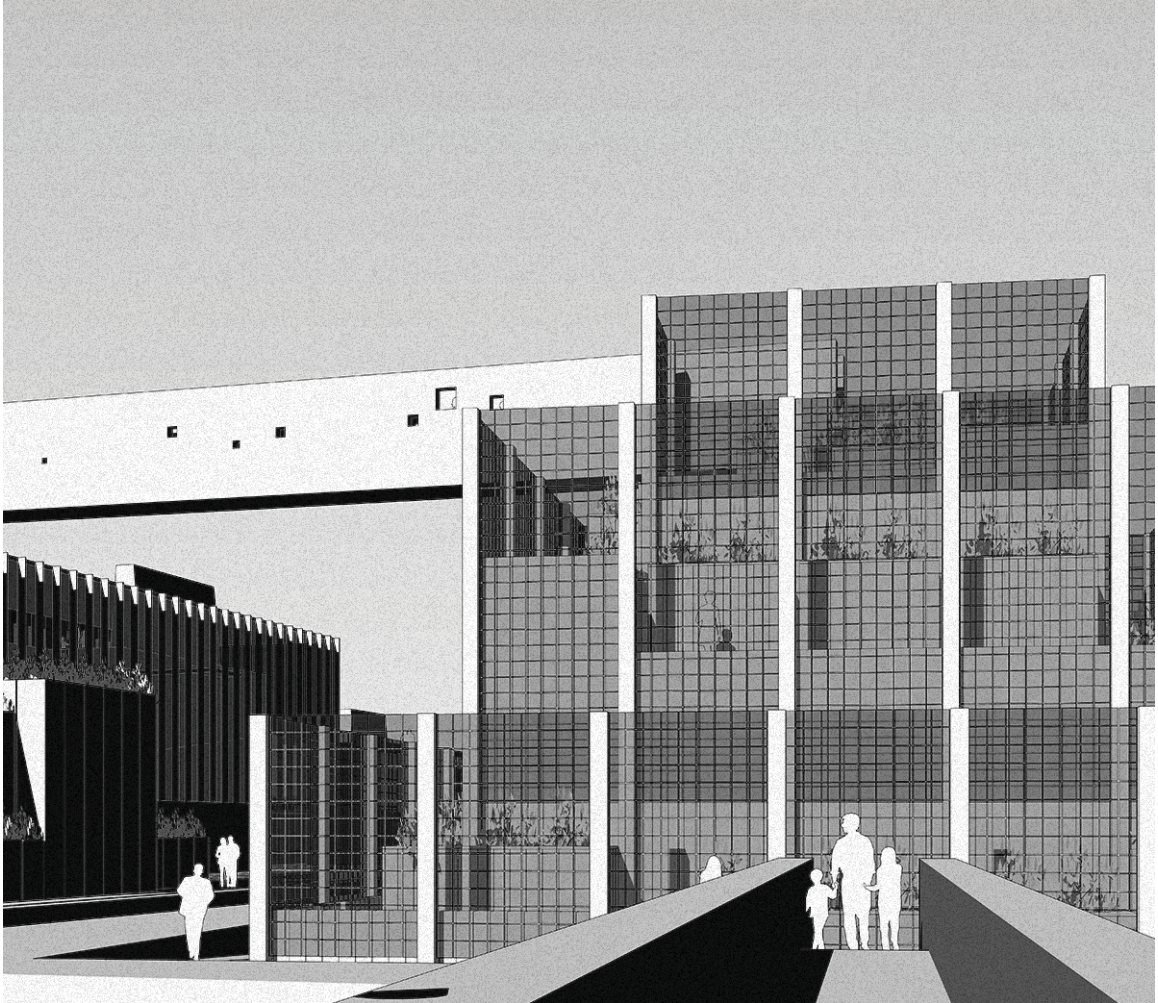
View from the bridge connecting shoreline to 'salt pans' platform
